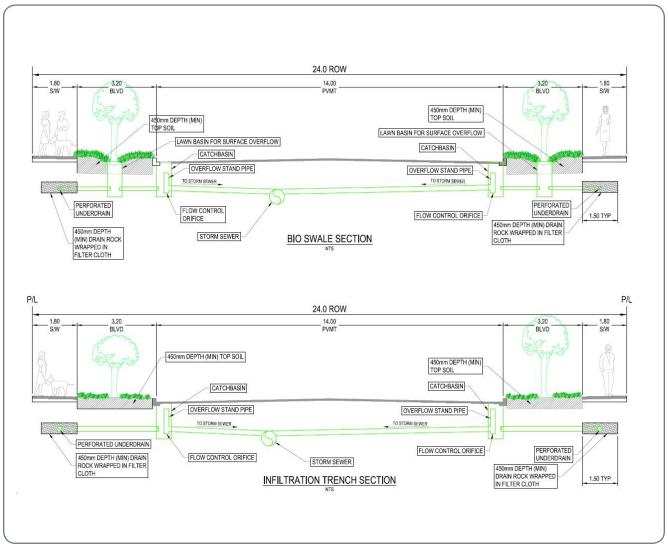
24 M Road Right-of-Way Bioswale & Infiltration Trench Cross-sections
